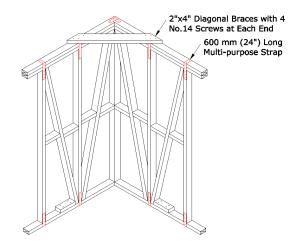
TIMBER FRAME BRACING AT WALL JUNCTIONS
